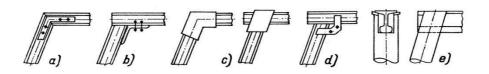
Joints in square rigid supports (a – locking plate, b – angle section, c – shoe, d – profiled sections; e – rail-pipe connection) [4]
